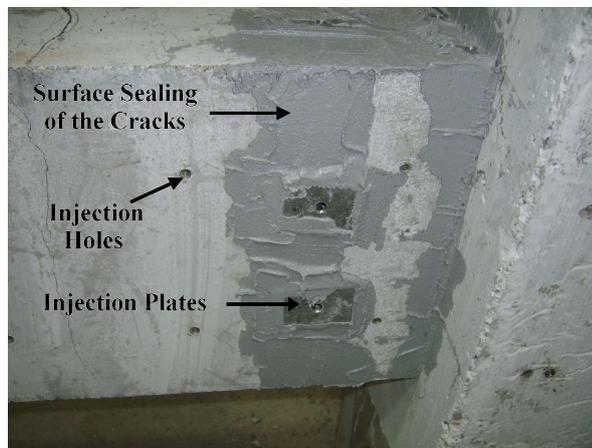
Sealing of the exposed surfaces of the cracks and injection plates
